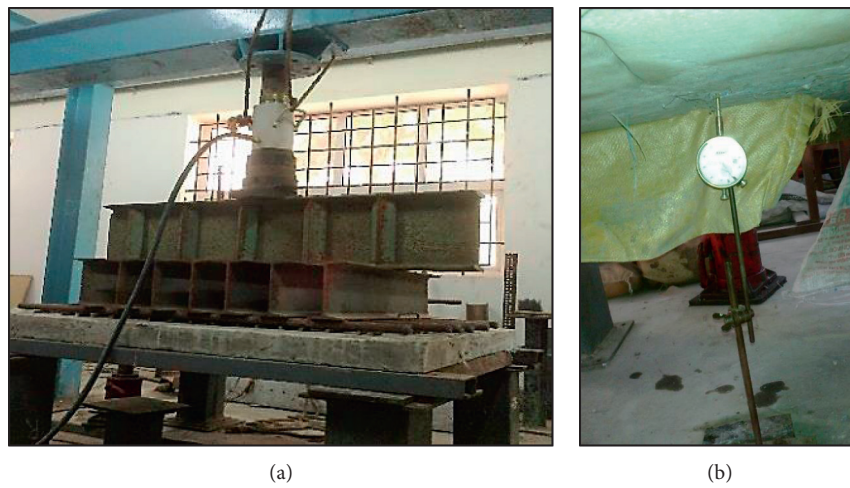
(a) Test setup of the slab under a loading frame. (b) LVDT at the middle of slab.
